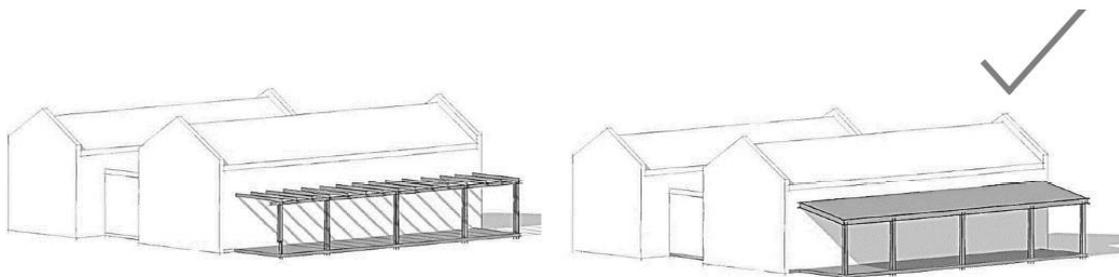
Example of an addition of a verandah roof on an existing pergola
